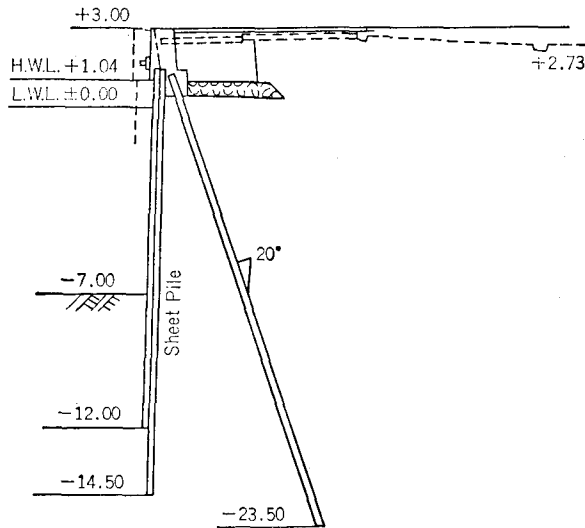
Cross Section of Sheetpile Bulkhead in Kitahama Pier in Hakodate Port
